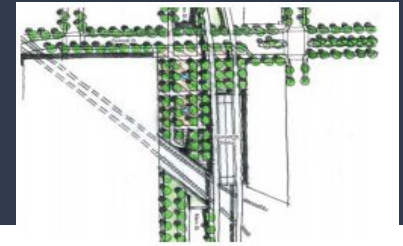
A transit plaza is recommended on top of the North Main Street tunnel.
